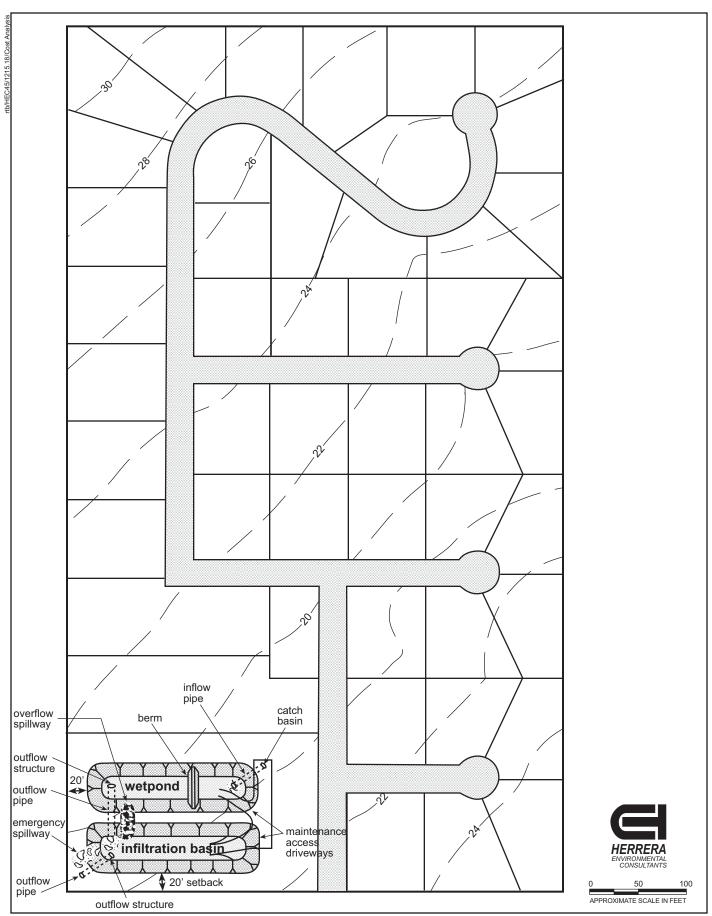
Permanent stormwater site plan BMPs for 10-acre residential development with infiltration.
